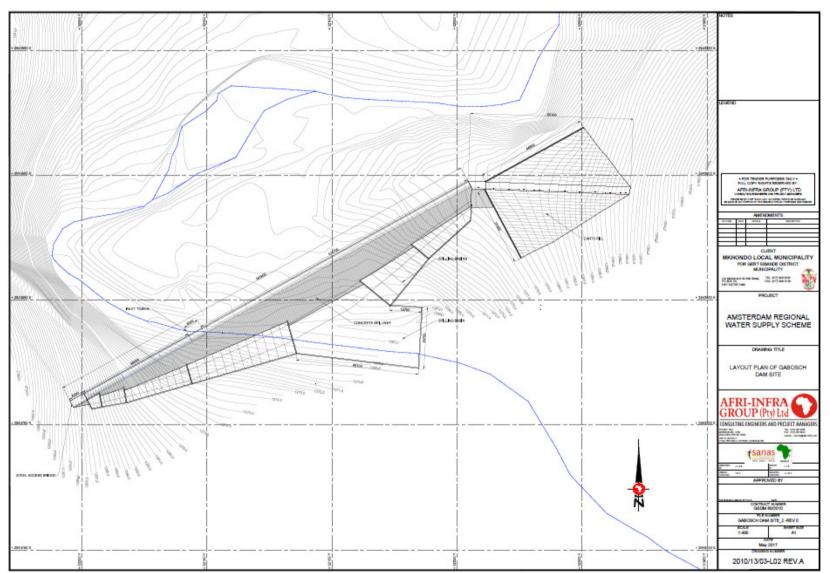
Option 1 - layout plan of the proposed Dam B and its components.
